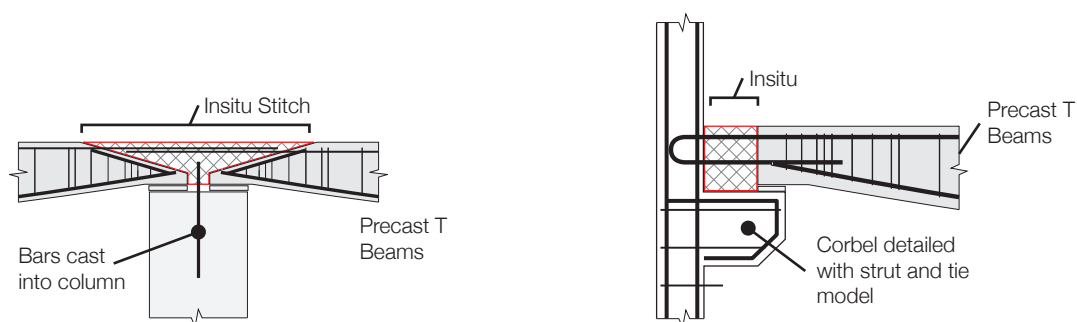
Detailing of fixed supports over a column (l); and at a corbel end (r).
